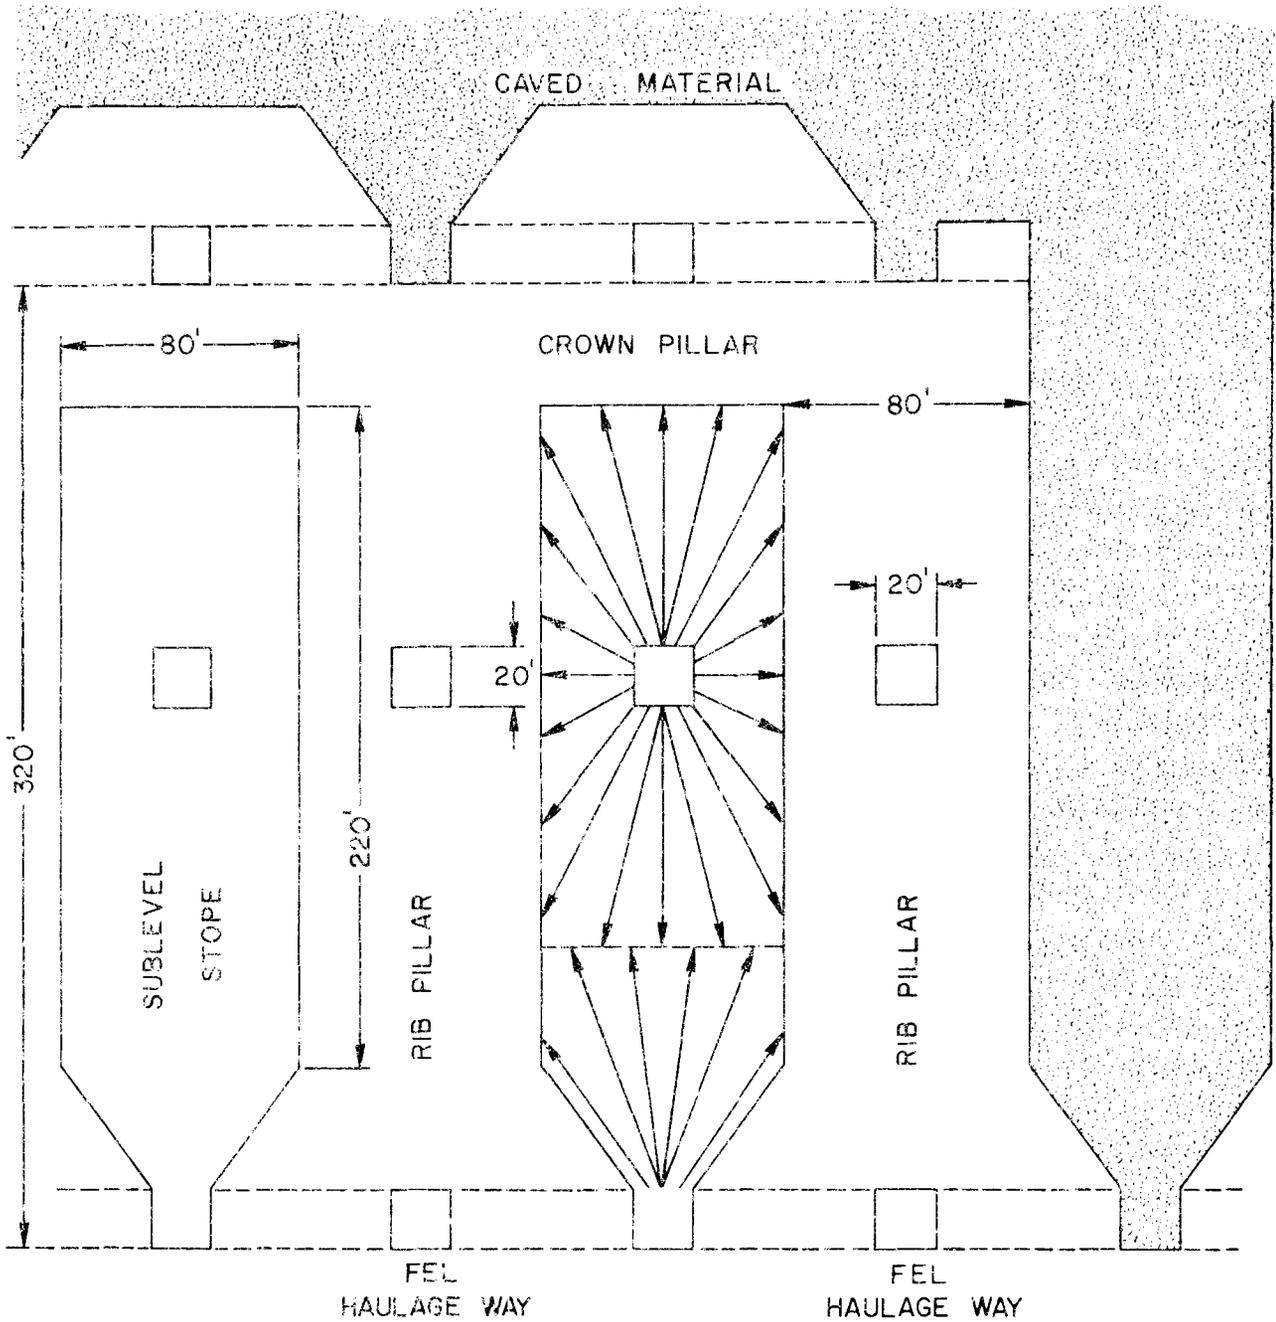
Vertical Section Through B-B', Sublevel Stopping with Full Subsidence
